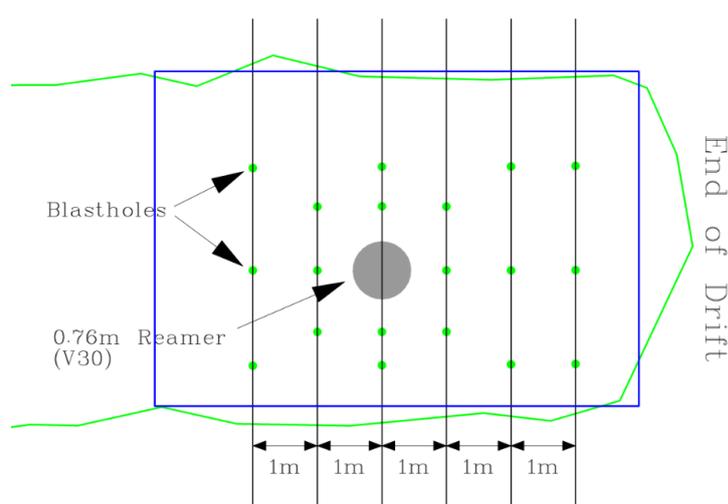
Plan view of typical slot (n.b. hole diameters are not to scale)
